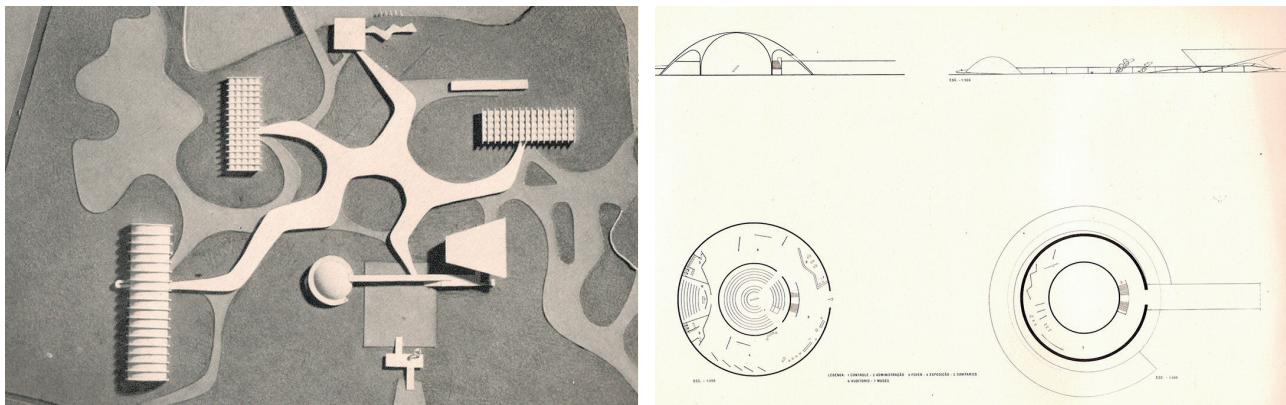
a) First version of the Buildings in the Park, as Proposed by Niemeyer's team. b) Design of the shell containing the auditorium, planetarium and exhibit areas (it was consistent with the first version for the Ibirapuera Park project). Sources: Papadaki (1954); and Anteprojeto da Exposição do IV Centenário de São Paulo (1952) / Figura 1. a) Primera versión del equipo coordinado por Niemeyer para la implantación de los edificios del Parque. b) Proyecto del casquete que abarcaba auditorio, planetario y áreas de exposición (acompañaba la primera versión del proyecto para el Parque Ibirapuera). Fuentes: Papadaki (1954); y "Anteprojeto da Exposición do IV Centenário de São Paulo" (1952).
